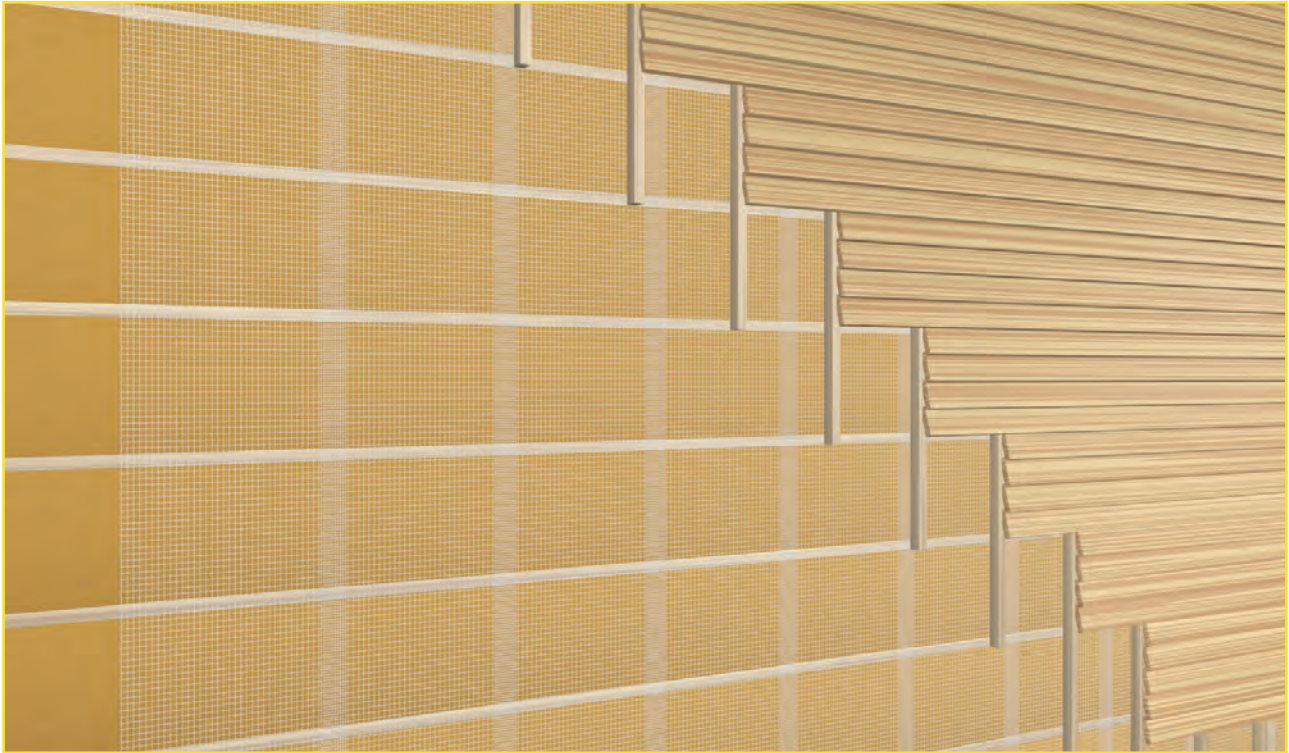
Shielding facade – The installation of the fabric is possible both horizontally and vertically. Depending on the type and alignment of the slats. The grounding occurs with a grounding cable cross section of 16 mm².
